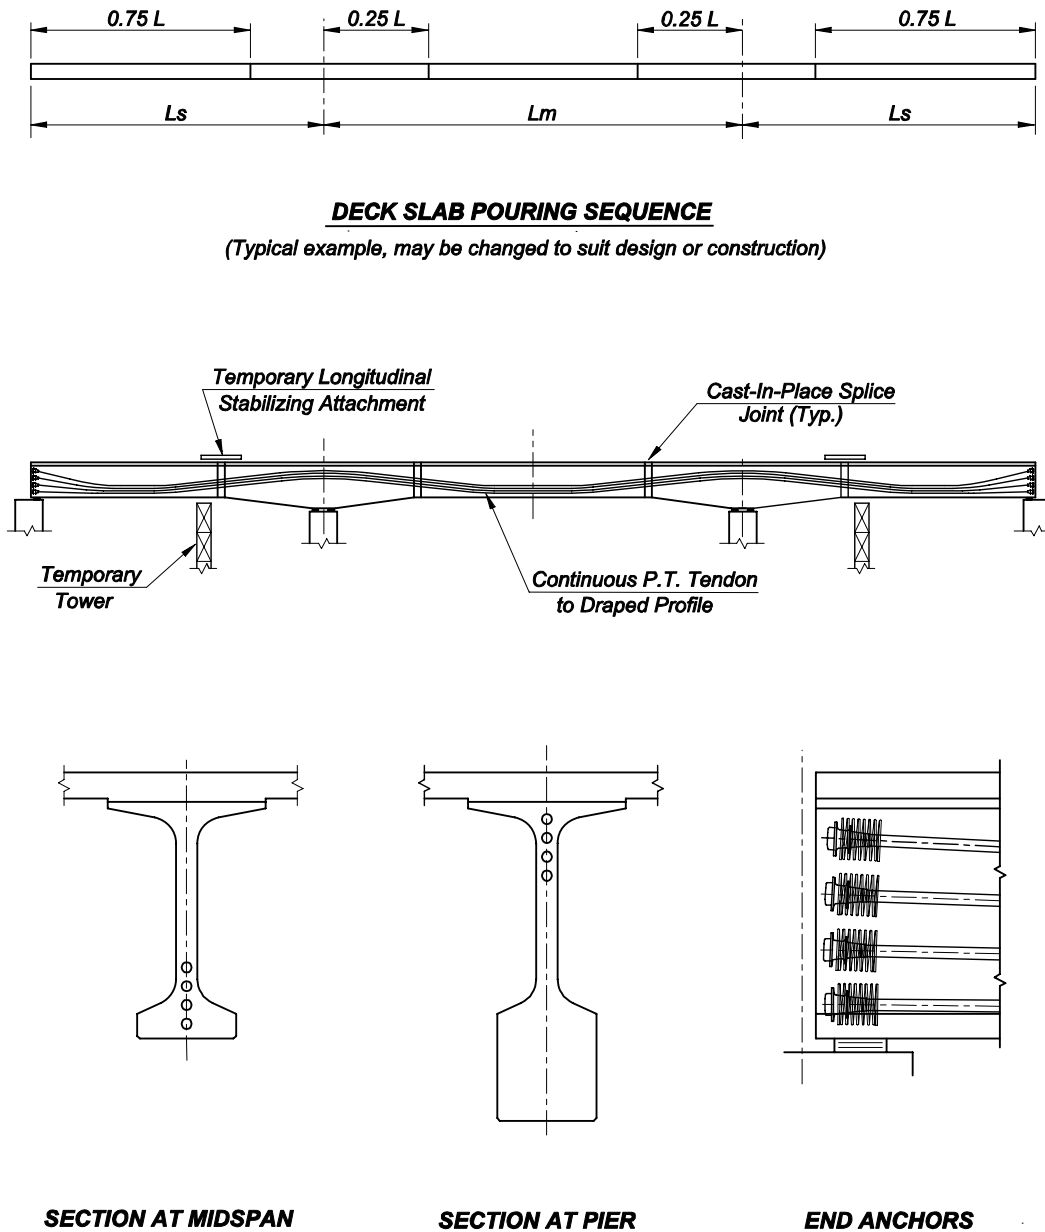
Post-Tensioning for 3-Span Haunched Girder Unit
